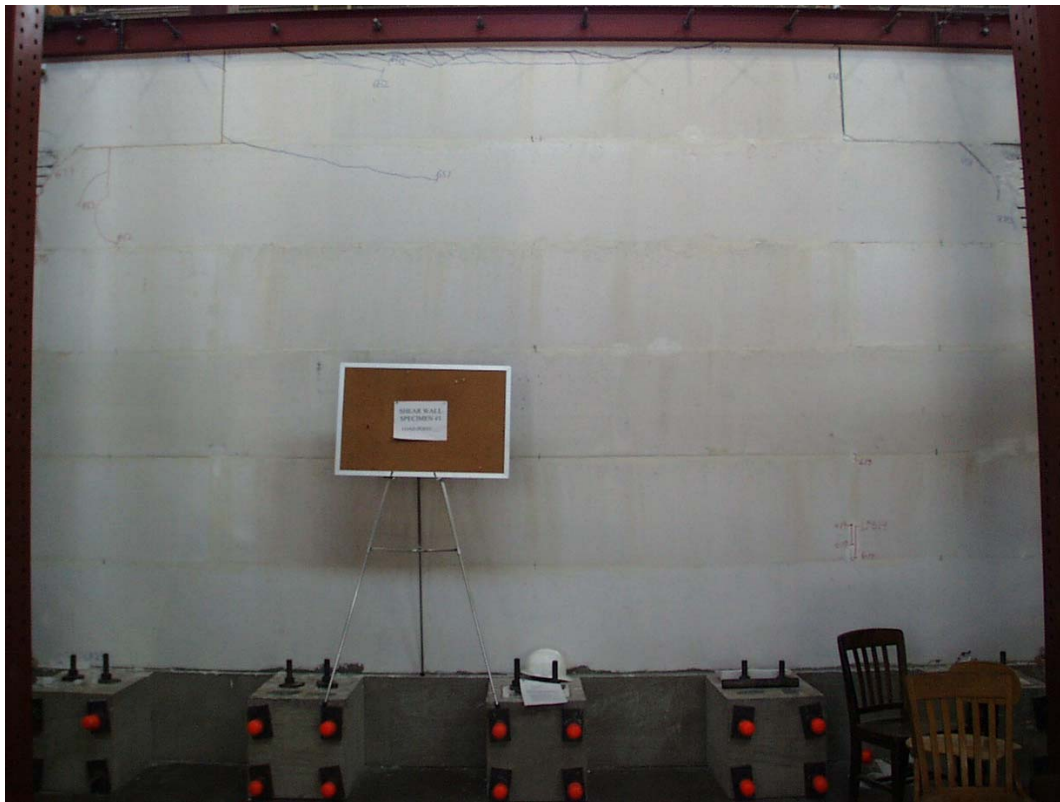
Shear Wall Pilot Specimen 2 at end of test
